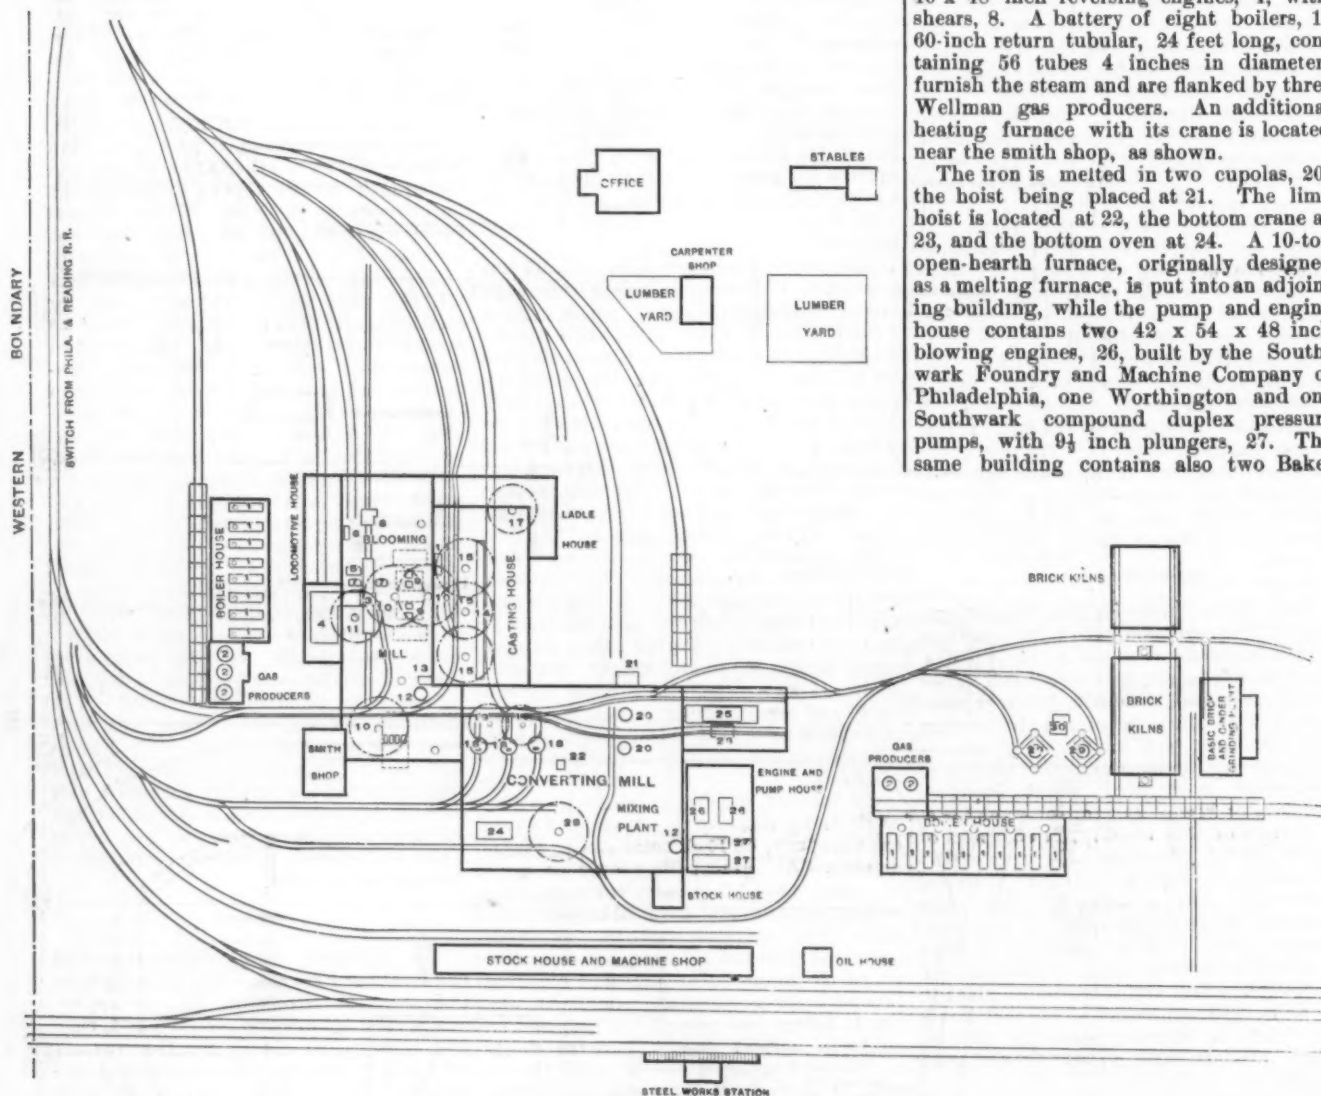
General Plan of Basic Bessemer Steel Works, Pottstown Iron Company, Pottstown, Pa.
